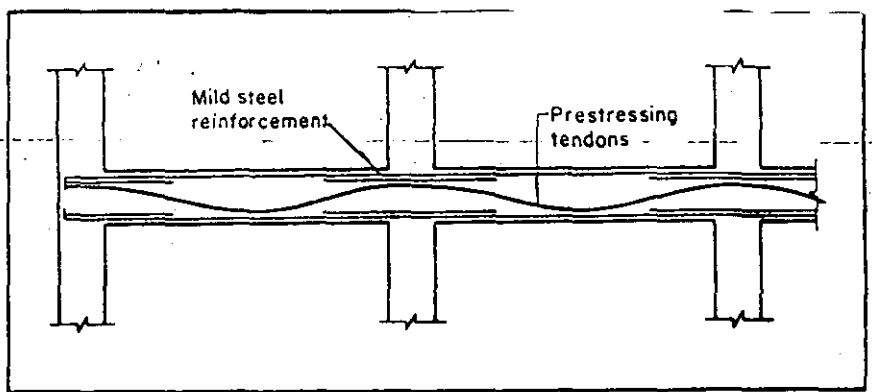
Cast-in-place frames with post-tensioned concrete beams.
